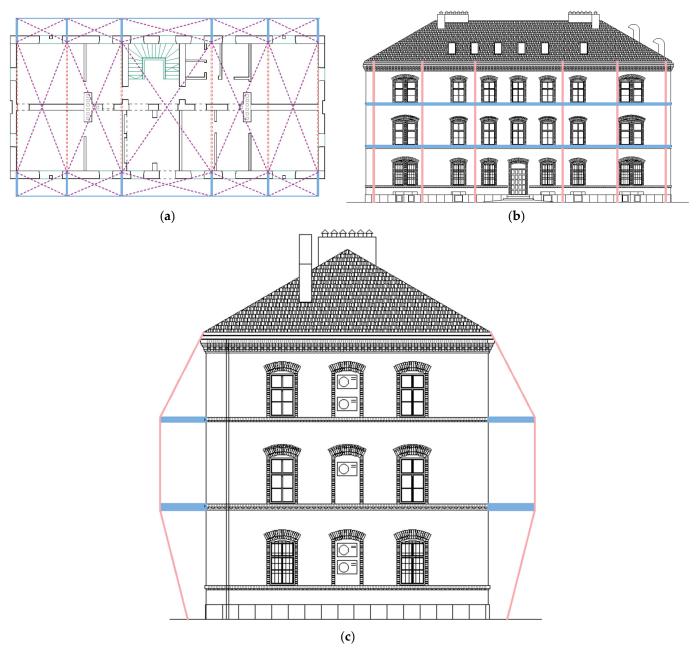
Alternative solution for the retrofitting: (a) ground floor plan; (b) longitudinal section; (c) transversal section.
